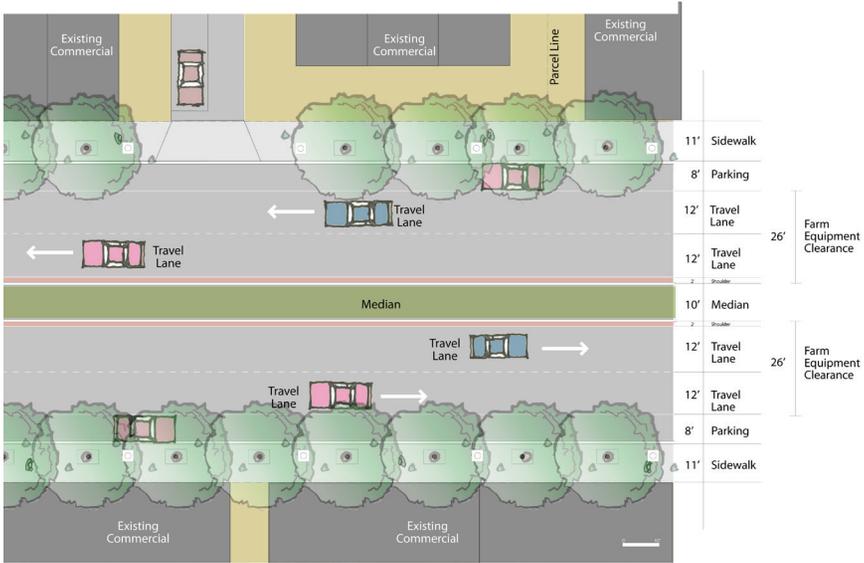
INTERSECTION AND BLOCK PLAN VIEW OF COMPLETE STREETS CONCEPT OPTION A
